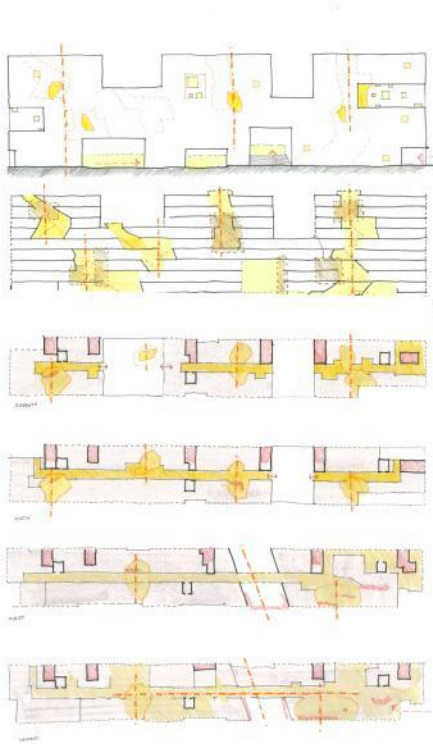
Simmons Hall Building Section, Elevations and Plan Overlay
